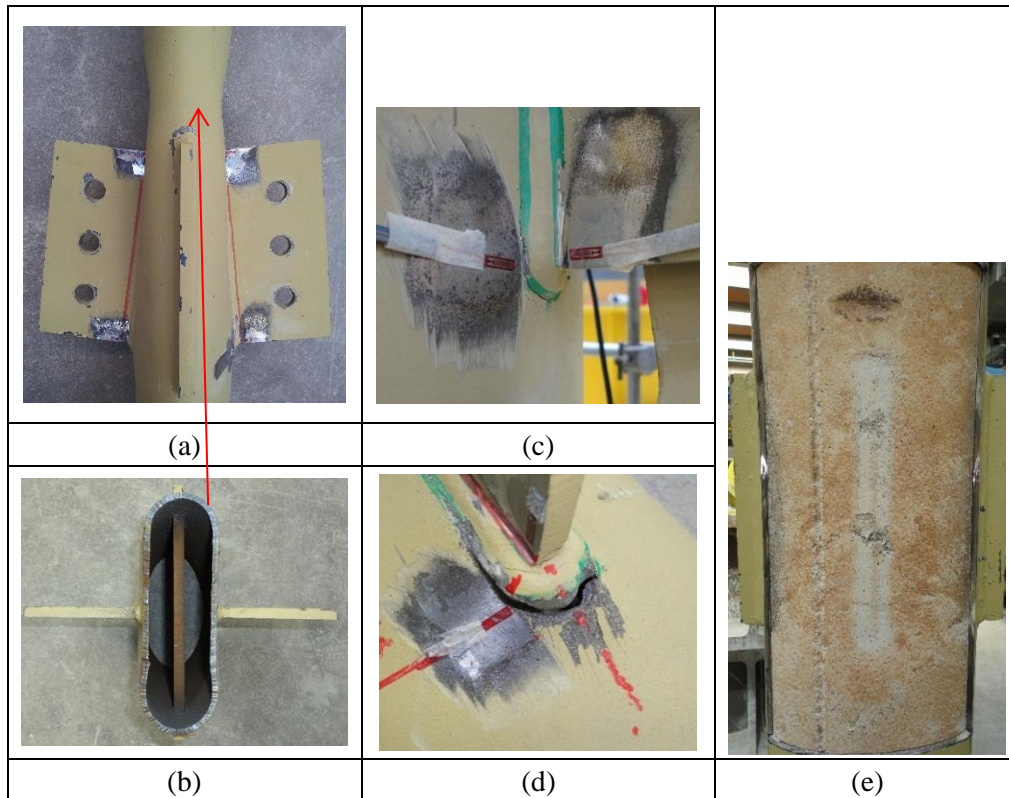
Failure of Type-E connections: (a) Joint-E; (b) Top section of Joint-E column; (c) Initial cracks of Joint-EC; (d) Fracture failure of Joint-EC; (e) Core concrete of Joint-EC
